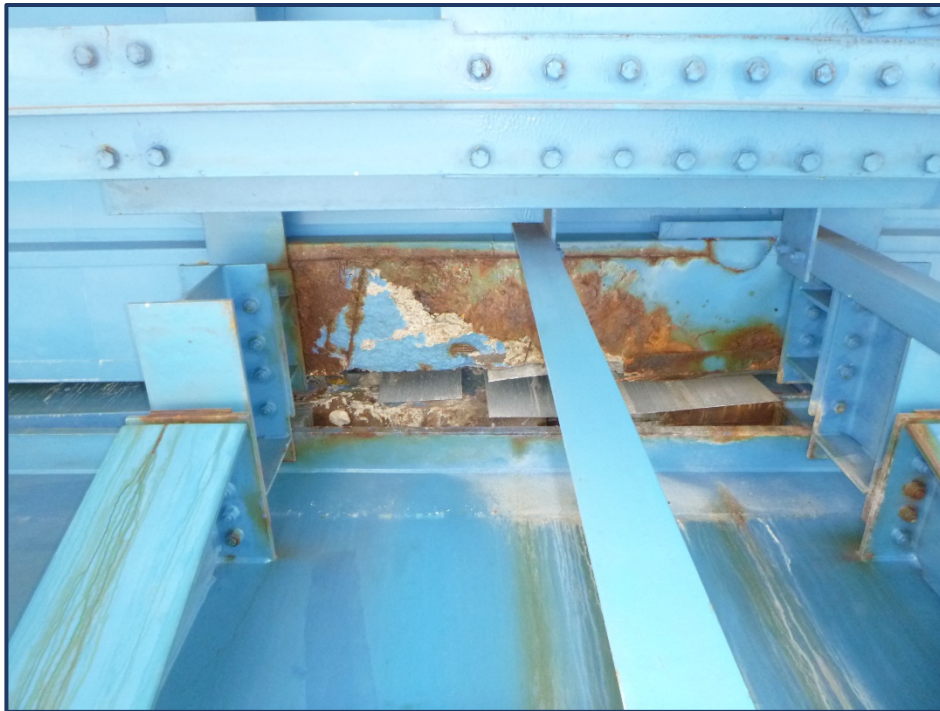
Unit II, Joint L Header Spalled and Delaminated Concrete
